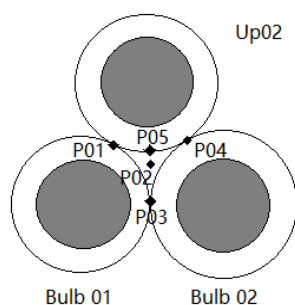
Side view of the installation structure of bulbs 01, 02, and Up02 with an average spacing of 12 cm between bulbs. The PPT measurements were carried out on the vertical surface of the pit wall where the three bulbs were exposed at their maximum profiles.
